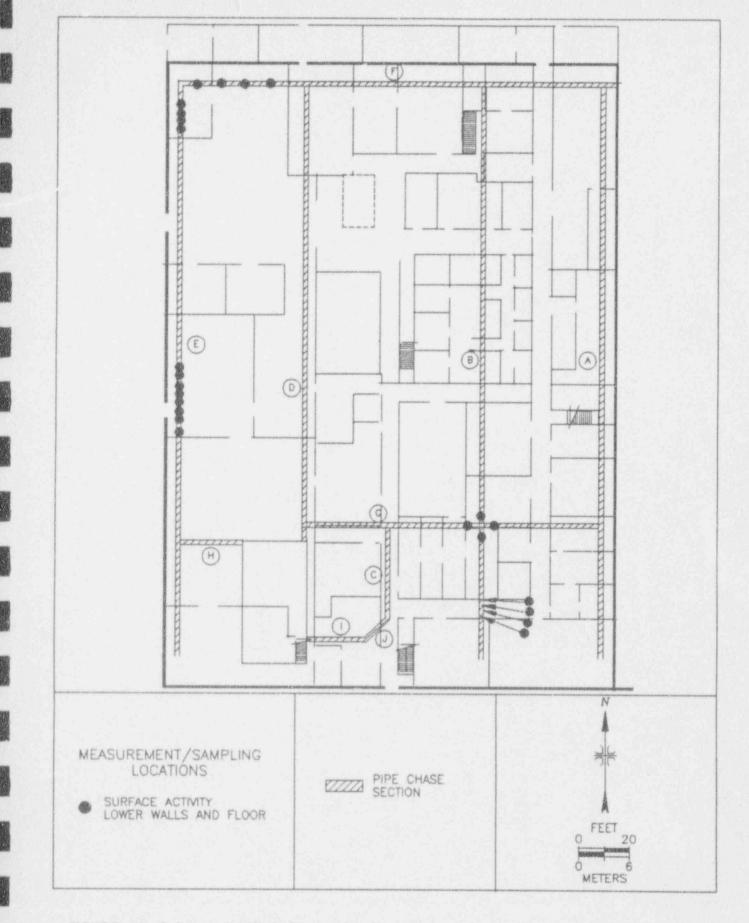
Building 9, First Floor Pipe Chases - Measurement and Sampling Locations
